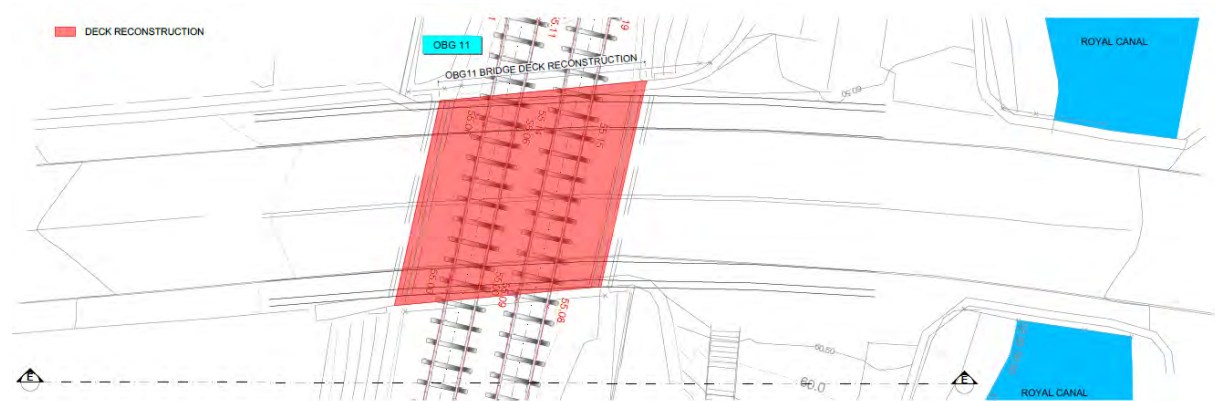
Deck reconstruction of OBG11 - Plan view
